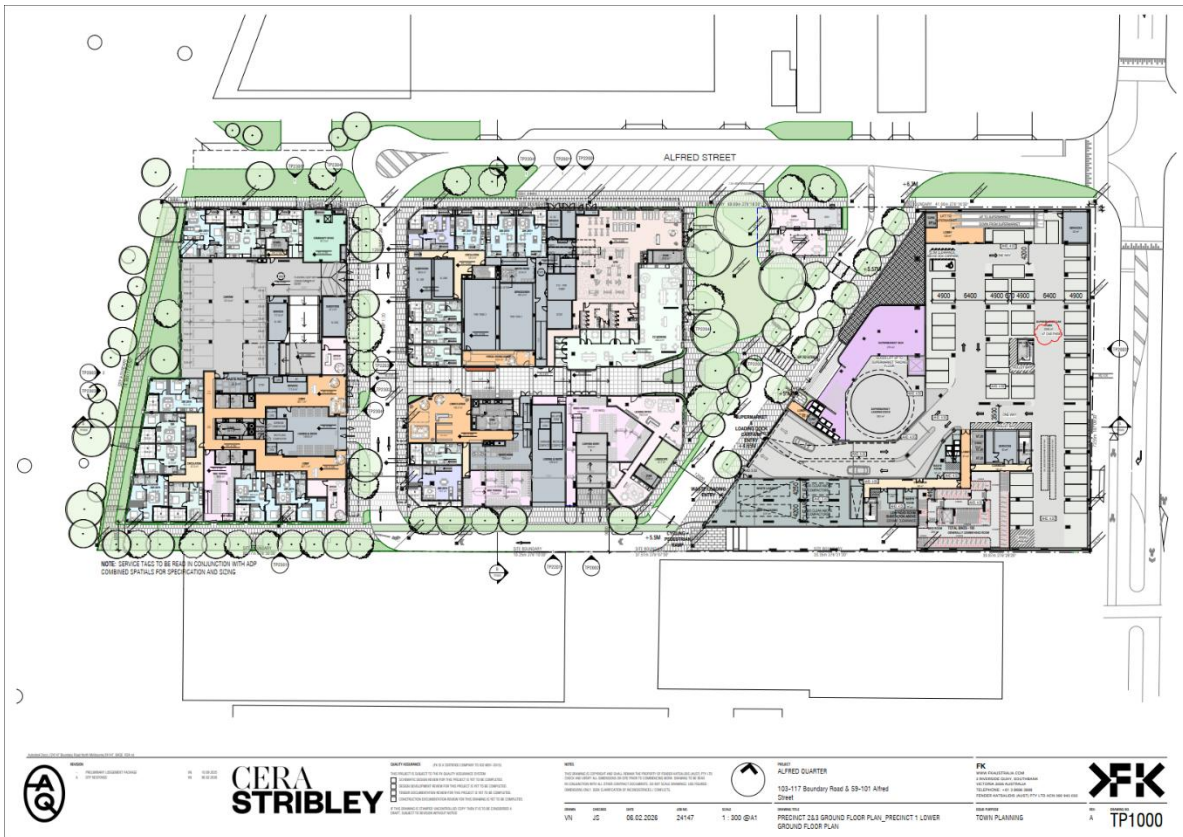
Precinct 2&3 Ground Floor and Precinct 1 Lower Ground Floor Plan
